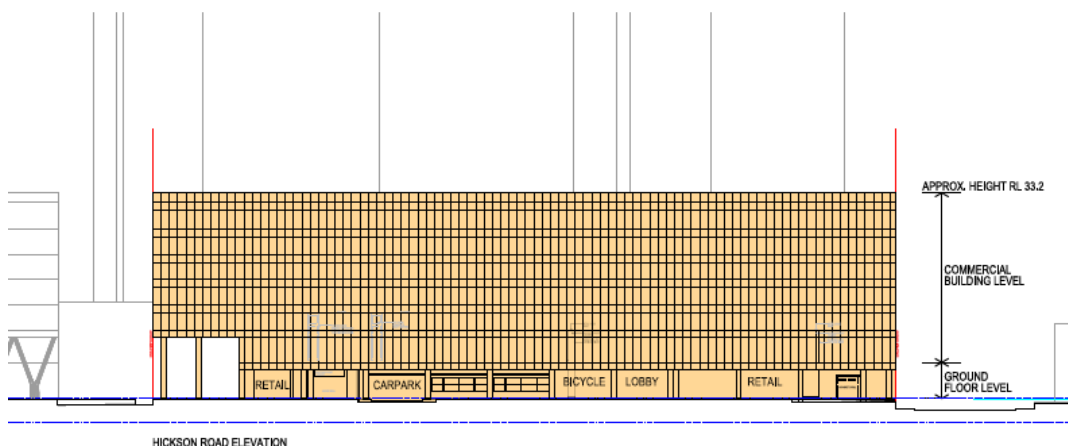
Indicative Hickson Road Elevation, demonstrating scale of the proposed development
